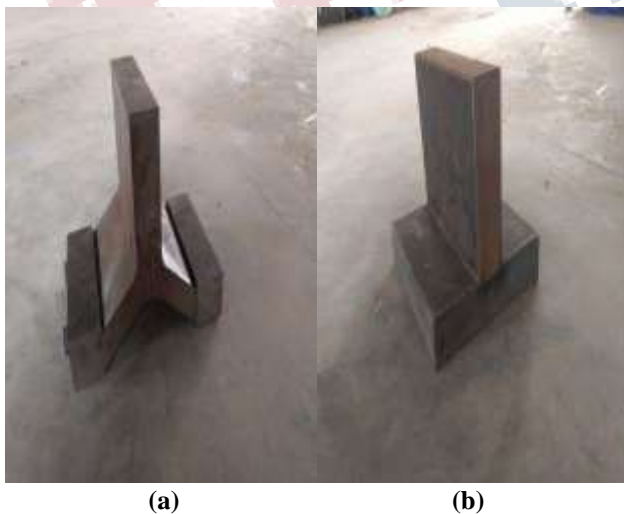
(a) Triangular shell footing with edge beam (b) Flat footing
